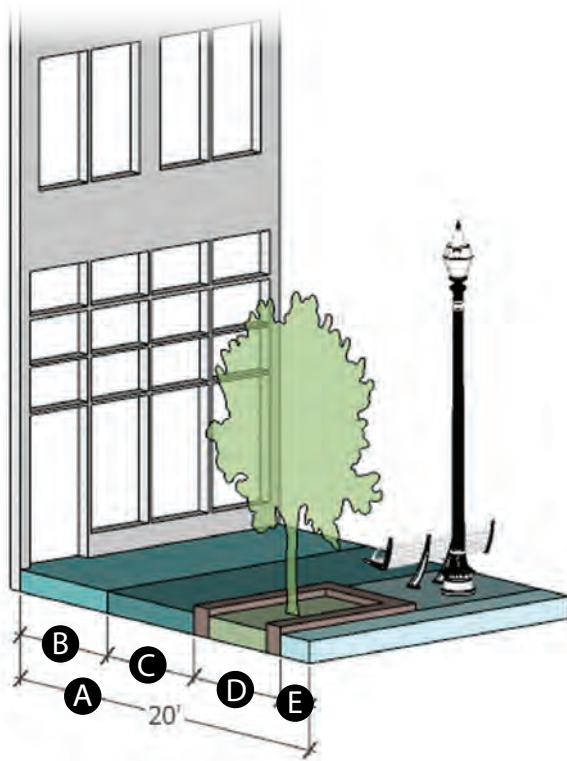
Downtown Core A Street Frontage Standards (Excluding Belcrest Road)
